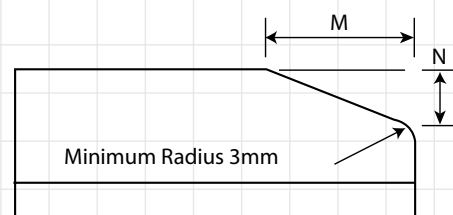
Chamfering of DI Pipe Cut Ends
